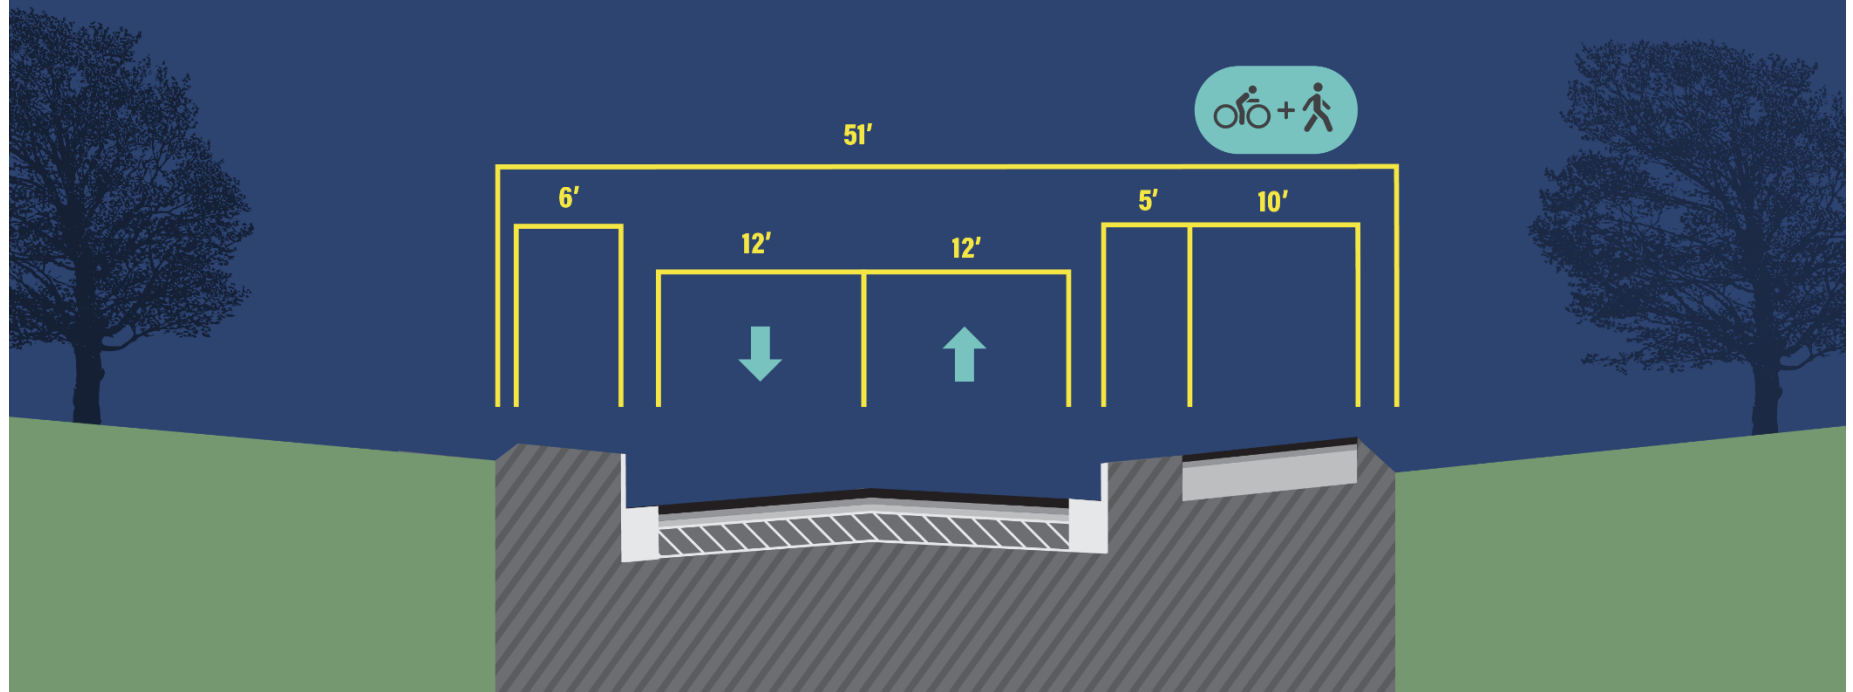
Laurel Hill Parkway Proposed Typical Section
